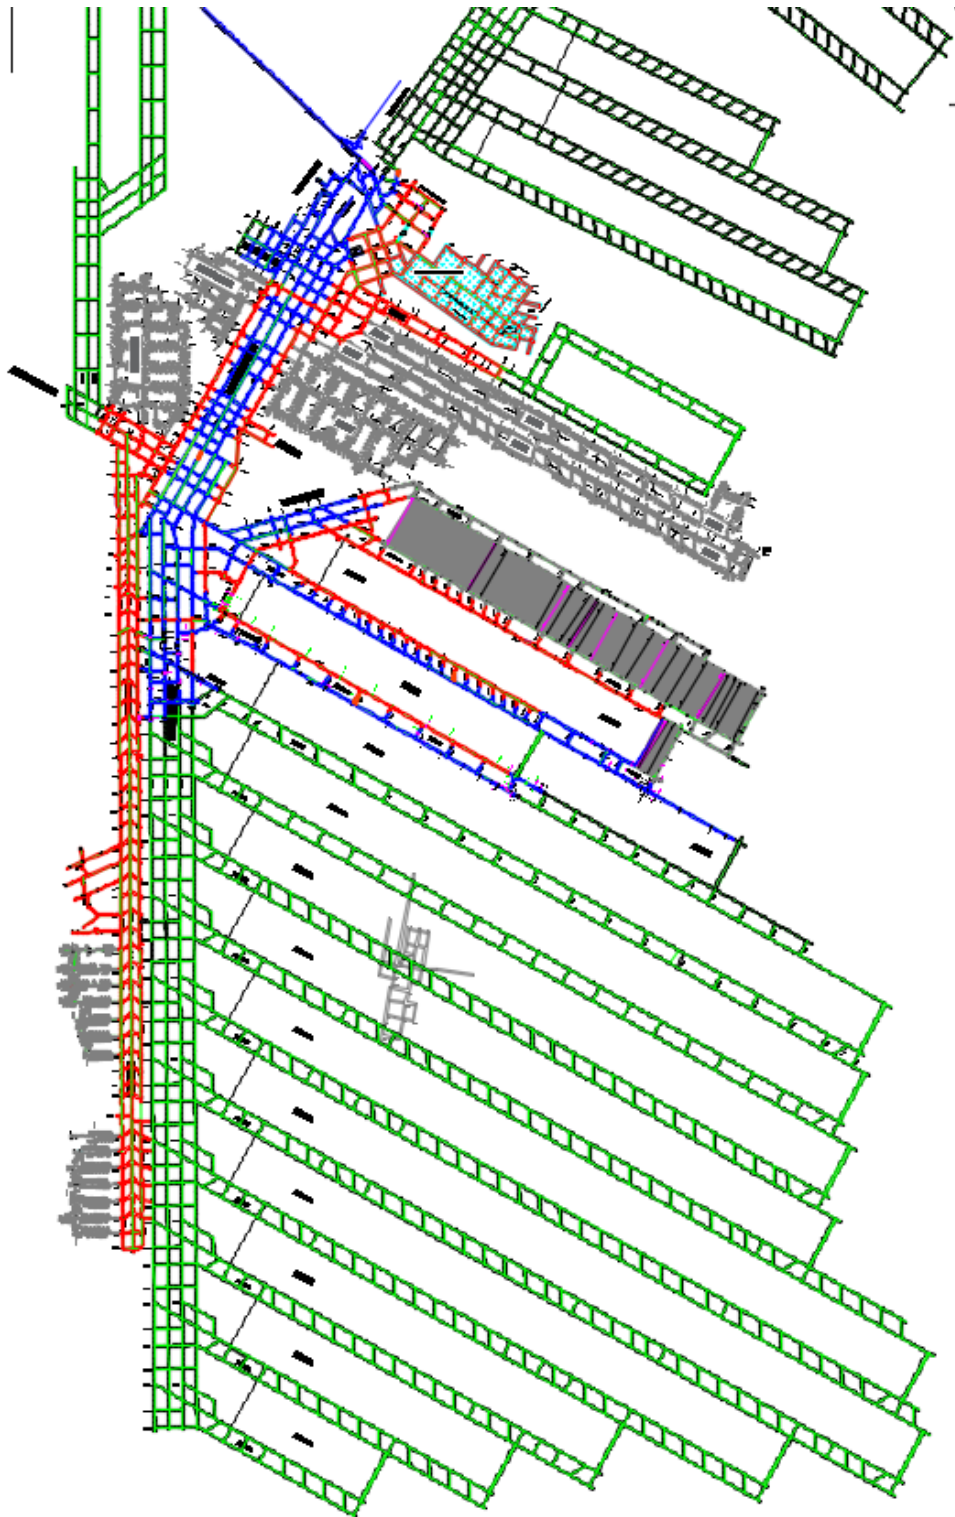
Mine Plan of Argo Seam Longwall Panels.
